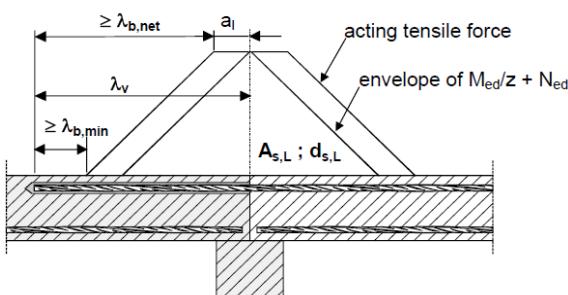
Anchoring of reinforcement to cover the line of acting tensile force
